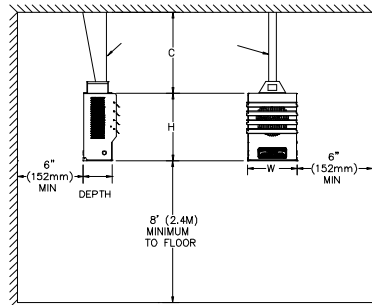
Horizontal Ceiling Mount with Mounting Arm
